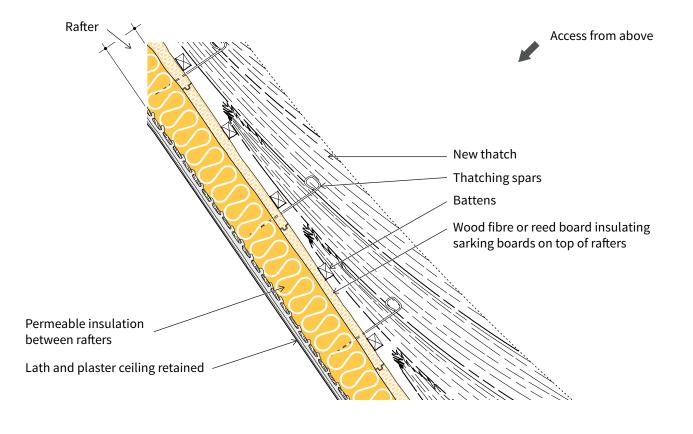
Warm roof – sloping ceiling (adding insulation from above, when thatch is stripped entirely)
